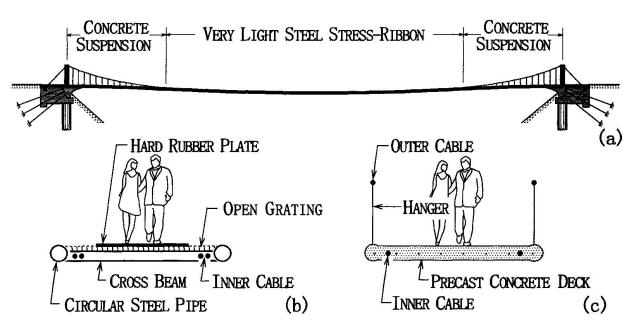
The proposed hybrid stress-ribbon pedestrian bridge. The elevation (a); the cross-section of the central portion of steel stress-ribbon deck (b); that of concrete suspension deck close to the abutment (c).
